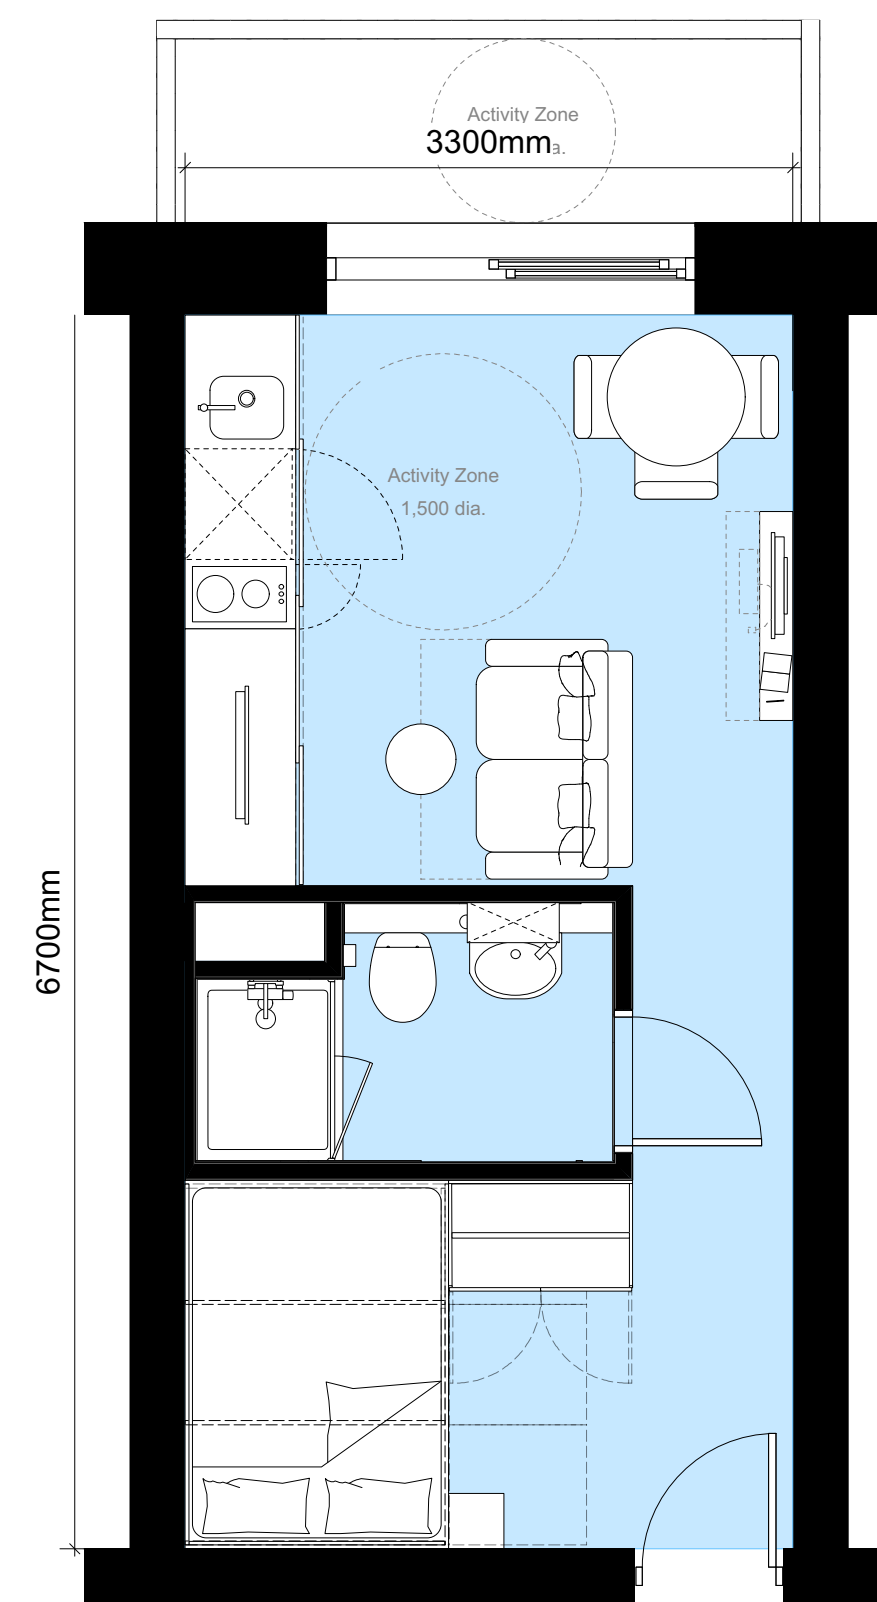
TYPICAL 21SQM ROOM LAYOUT
